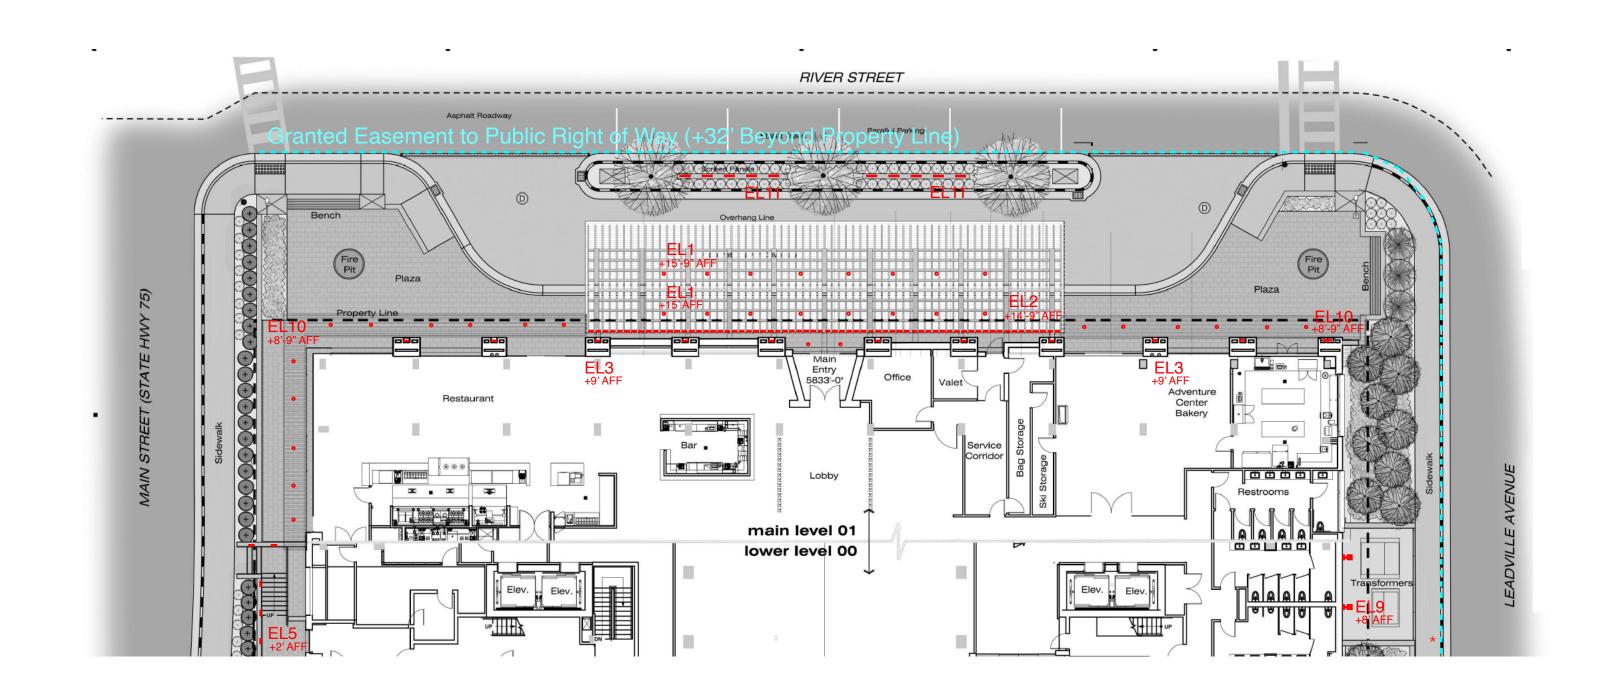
EXHIBIT B: Appellation Hotel Approved Exterior Lighting Plans
